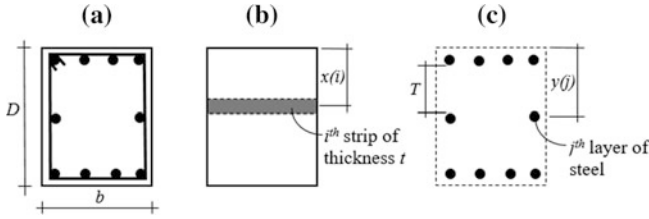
Design level sectional parameters: a cross section with reinforcement details, b typical strip for concrete, and c reinforcement layers
